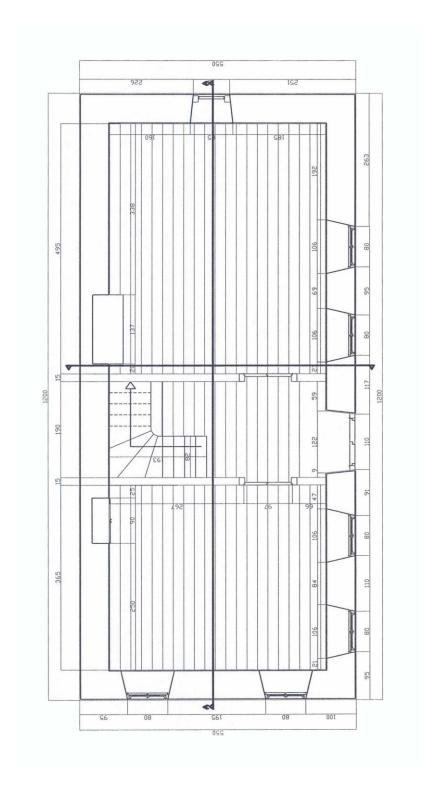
Ground Floor Plan of 39-Türkkuyusu Street Scale: 1/75
